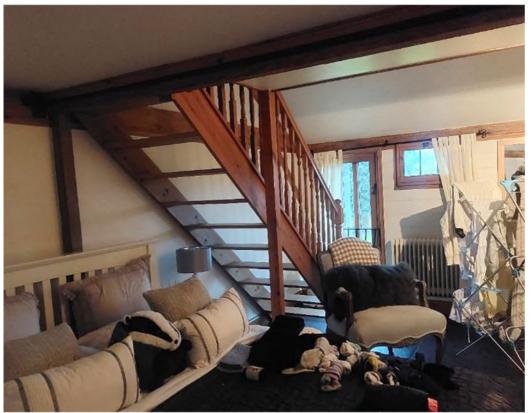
Modern stair within a bedroom at first floor level serving a mezzanine floor.
